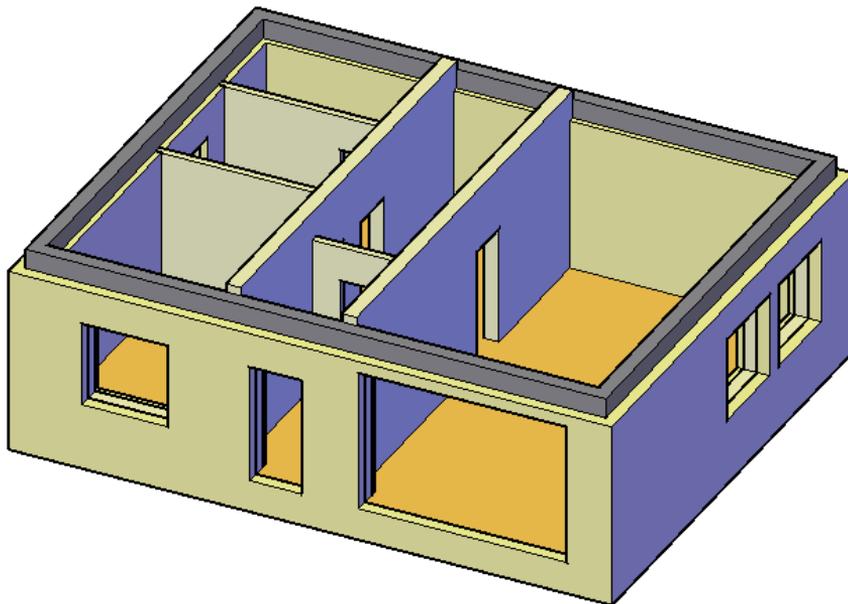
First floor of the modeled building with ring beam visible and extruded load-bearing internal walls
